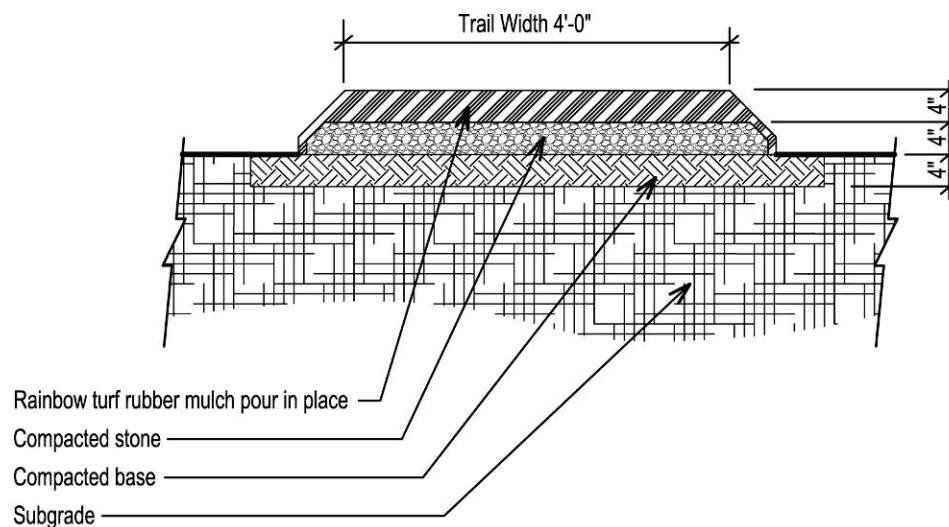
7: Typical Rainbow Turf Trail Surface Detail (follow manufacturer's specifications regarding site preparation, compaction, and binder).
